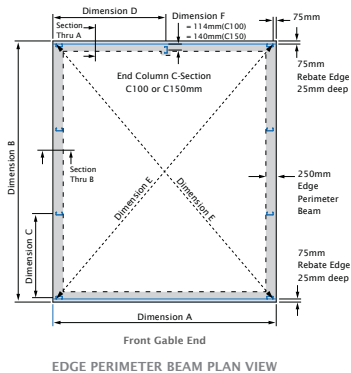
shows the orientation of the columns and the slab layout. Table 1 provides slab dimensions and column locations.
